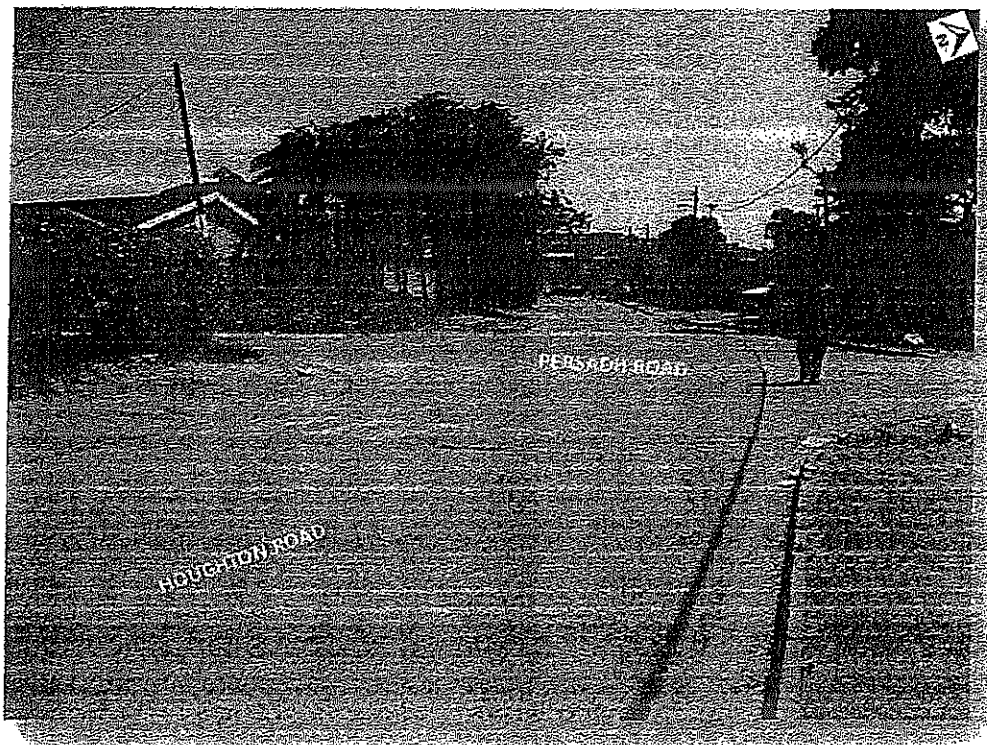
Intersection of Persadh Road and Houghton Road facing west
